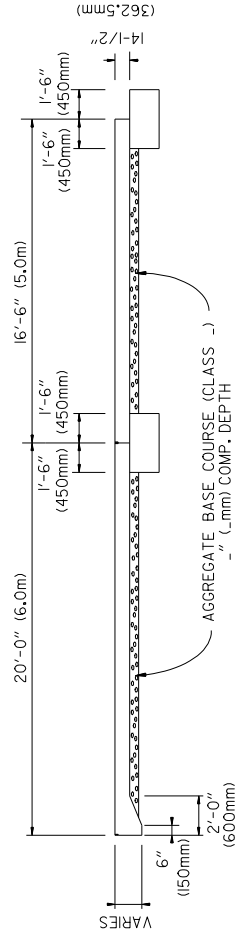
DETAIL FOR DRIVEWAY TURNOUTS (ARTERIALS)
